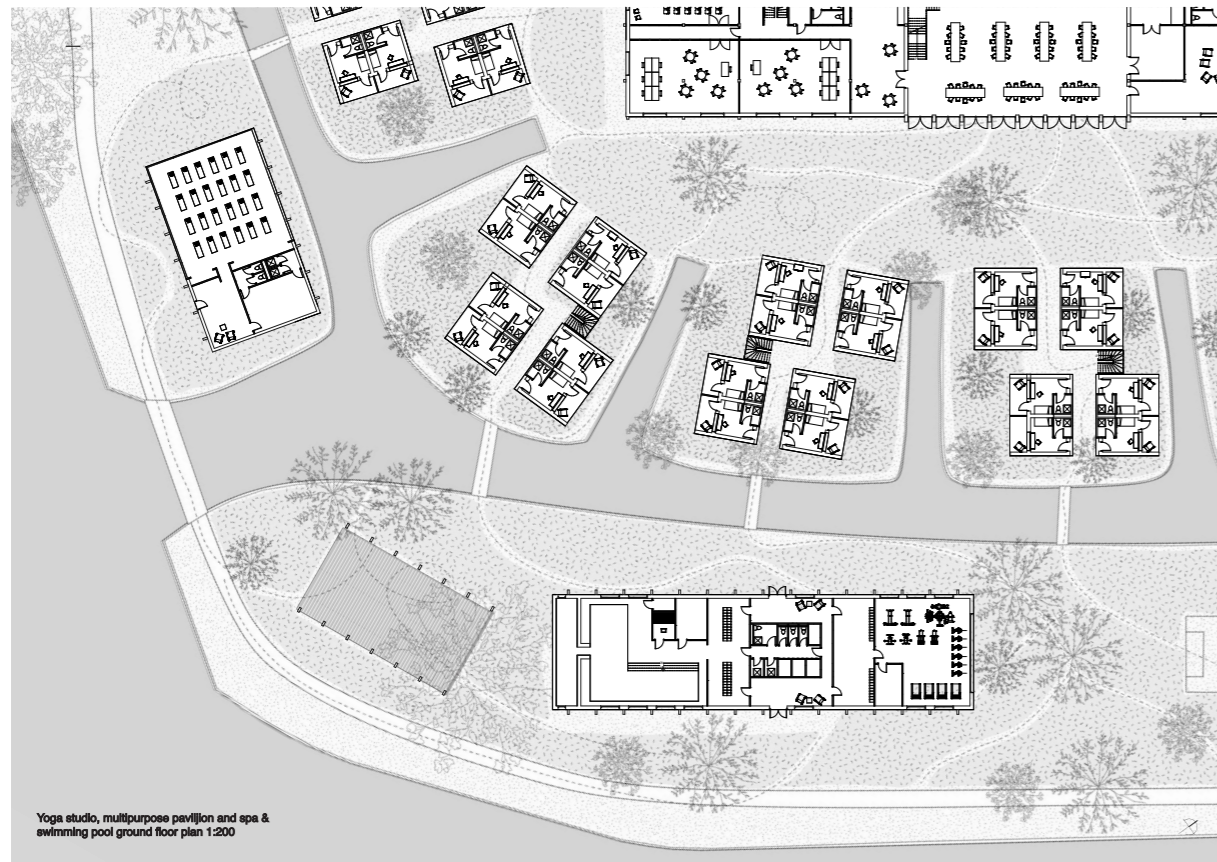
Yoga pavilion, wellness facility and multipurpose pavilion ground floor plan 1:200 rescaled. Source: Own work, 2026.
